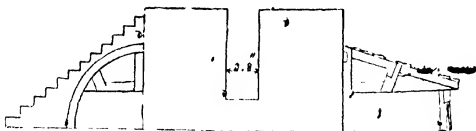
End elevation of Scotch kiln, showing doorway, ends of firing sheds, and steps leading to top of kiln.
